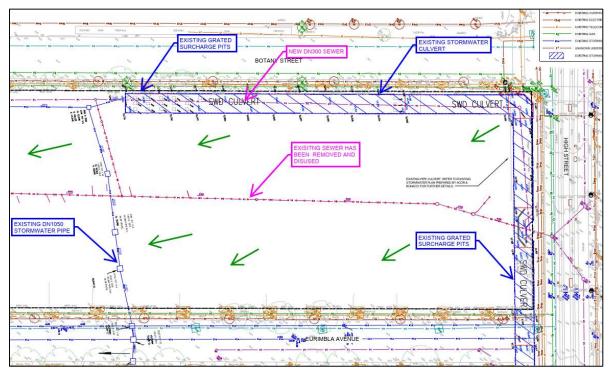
Existing Site Grading and Stormwater Infrastructure
